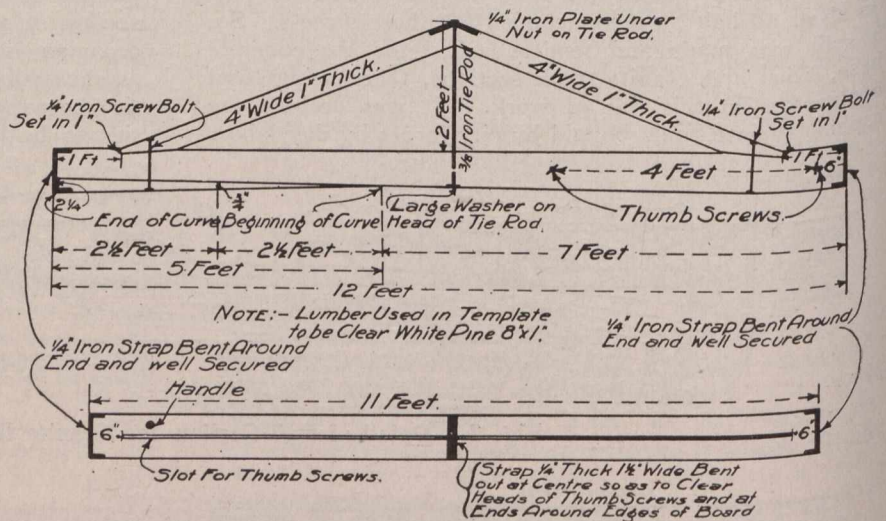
Details of Template Used by City of St. John, N.B., in Pavement Laying.
